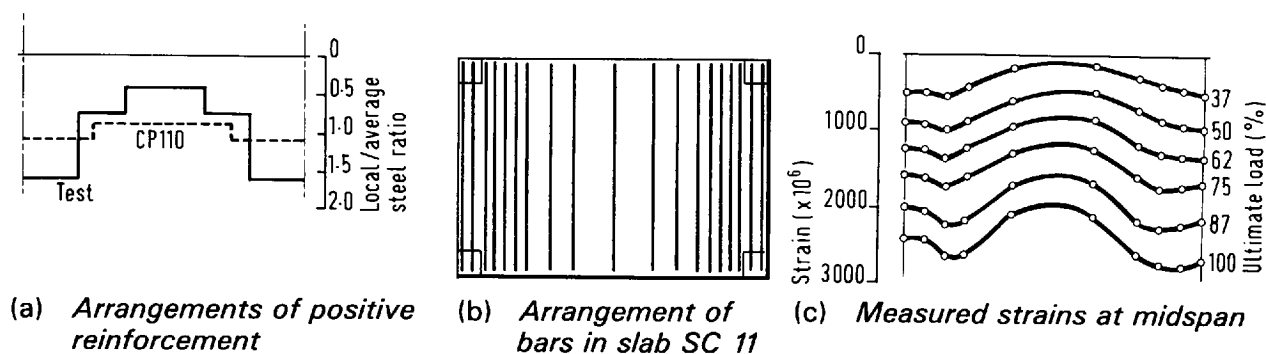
Reinforcement arrangements and steel strains—rectangular slab SC 11
